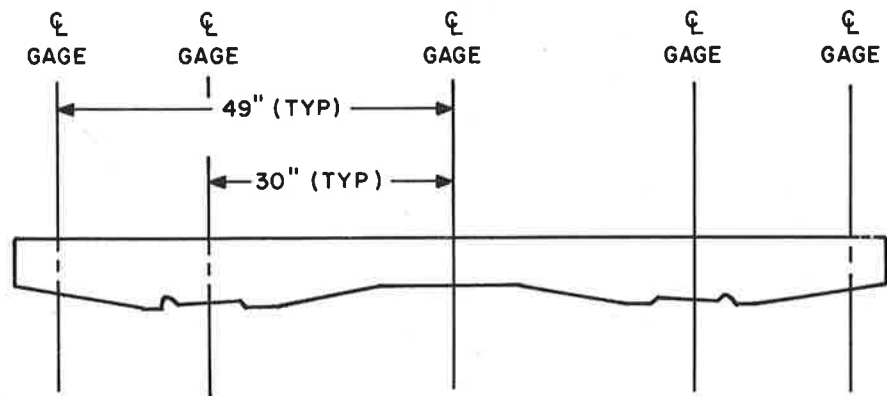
RAIL SEAT MARKING TEMPLATE DETAILS, STRAIN GAGE LOCATING FIXTURE
